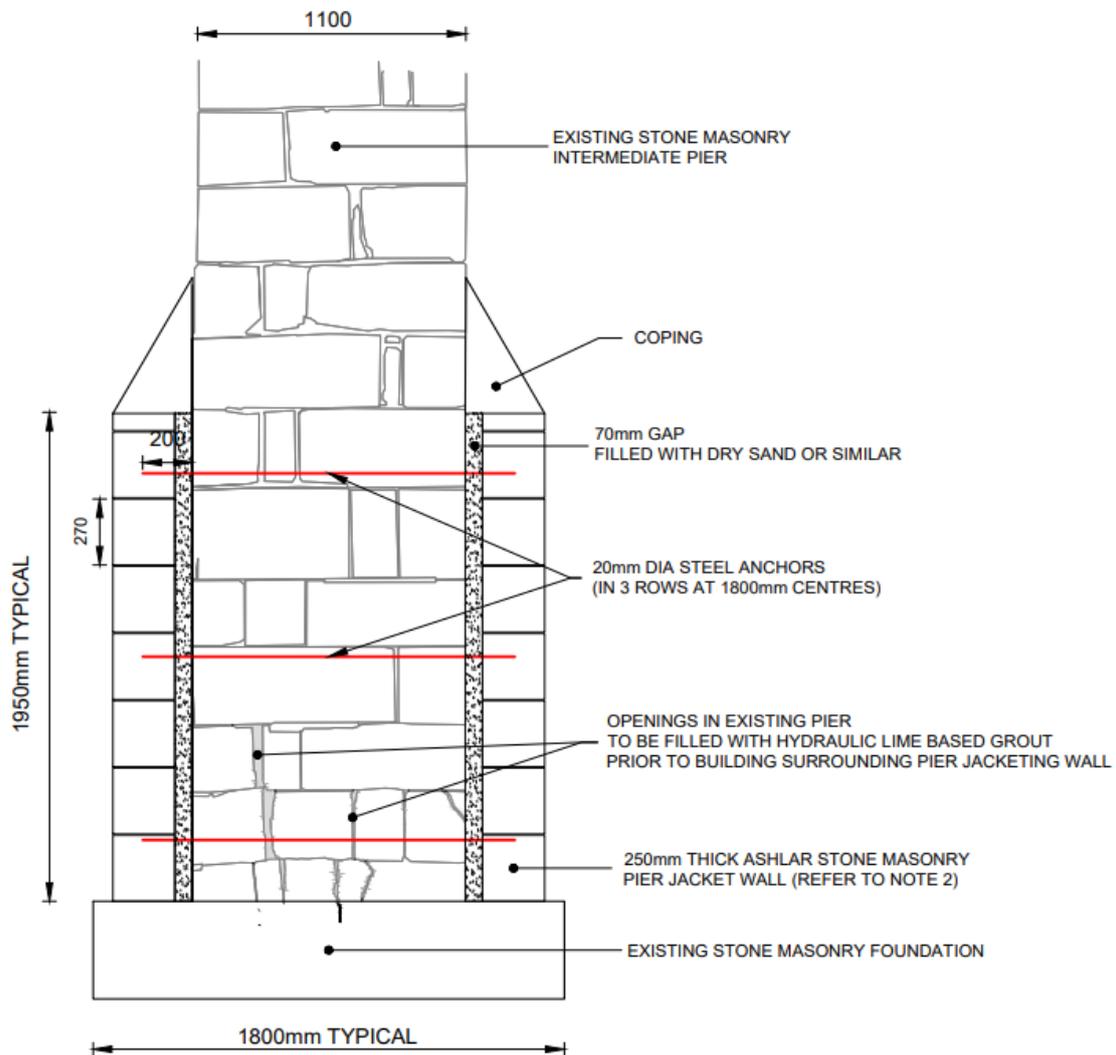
Sketch showing existing Pier cross-section and Pier jacketing wall with ties
